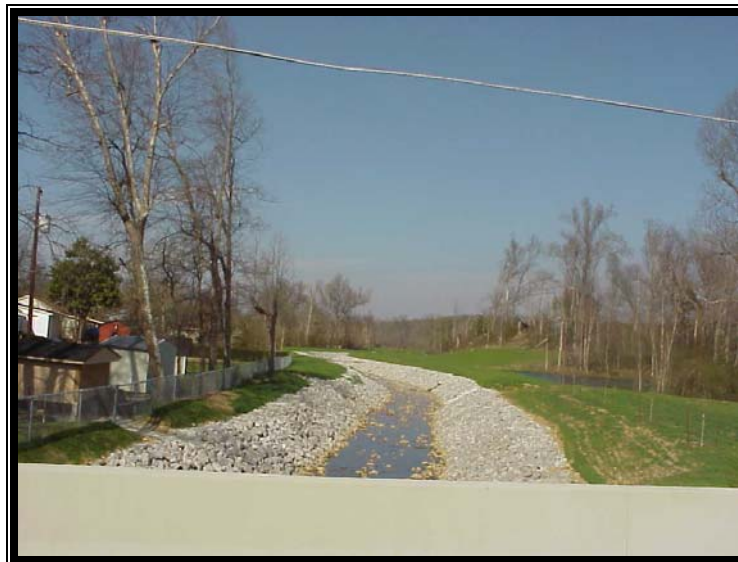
IC-1, Looking Downstream from Eastport Road, March 2000.
